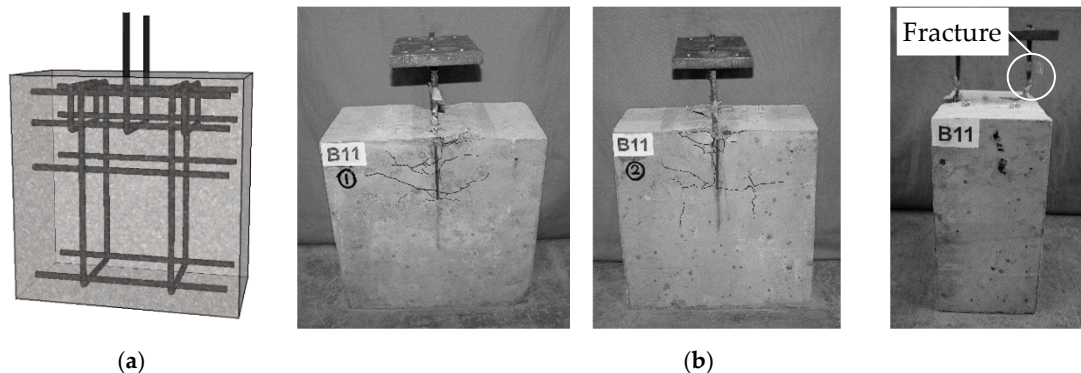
Crack and failure mode of interval arrangement in Group B. (a) Interval arrangement; (b) Crack pattern of B11.
